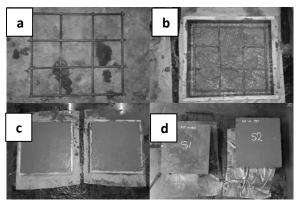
Preparation of slab panel; (a) Reinforcement arrangement, (b) and (c) Pouring of concrete, (d) Curing of slab panel
